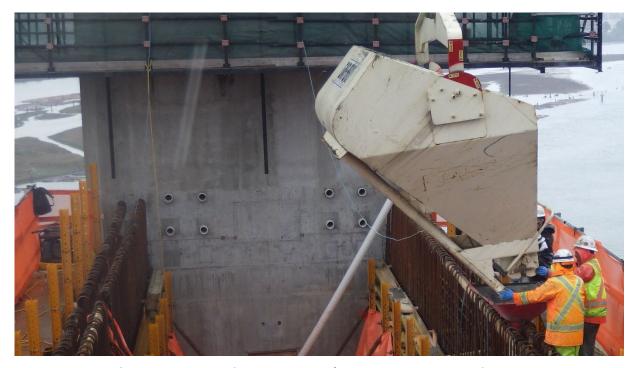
Crews Pouring Concrete For The Upper Cross Beam On Pier S1 Tower
